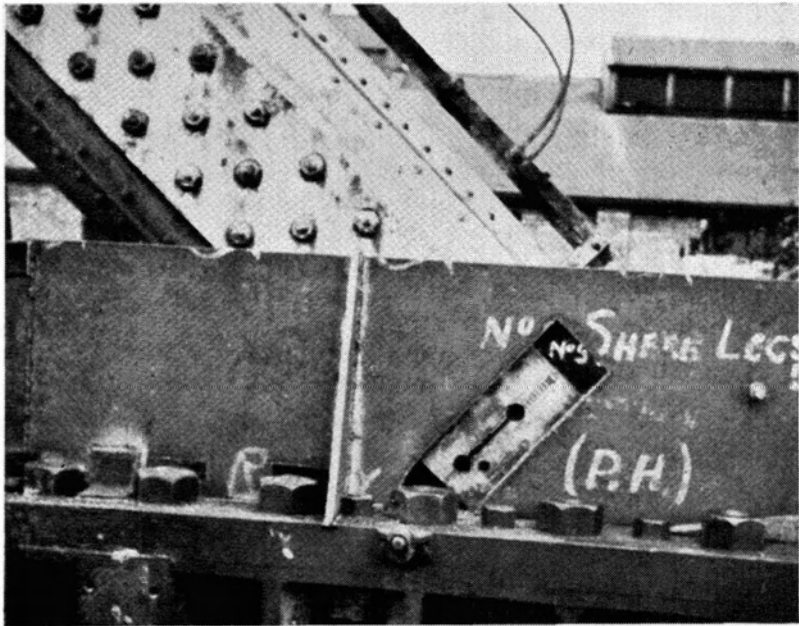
CUT BETWEEN HOLES DRILLED IN ANCHORAGE PLATE
